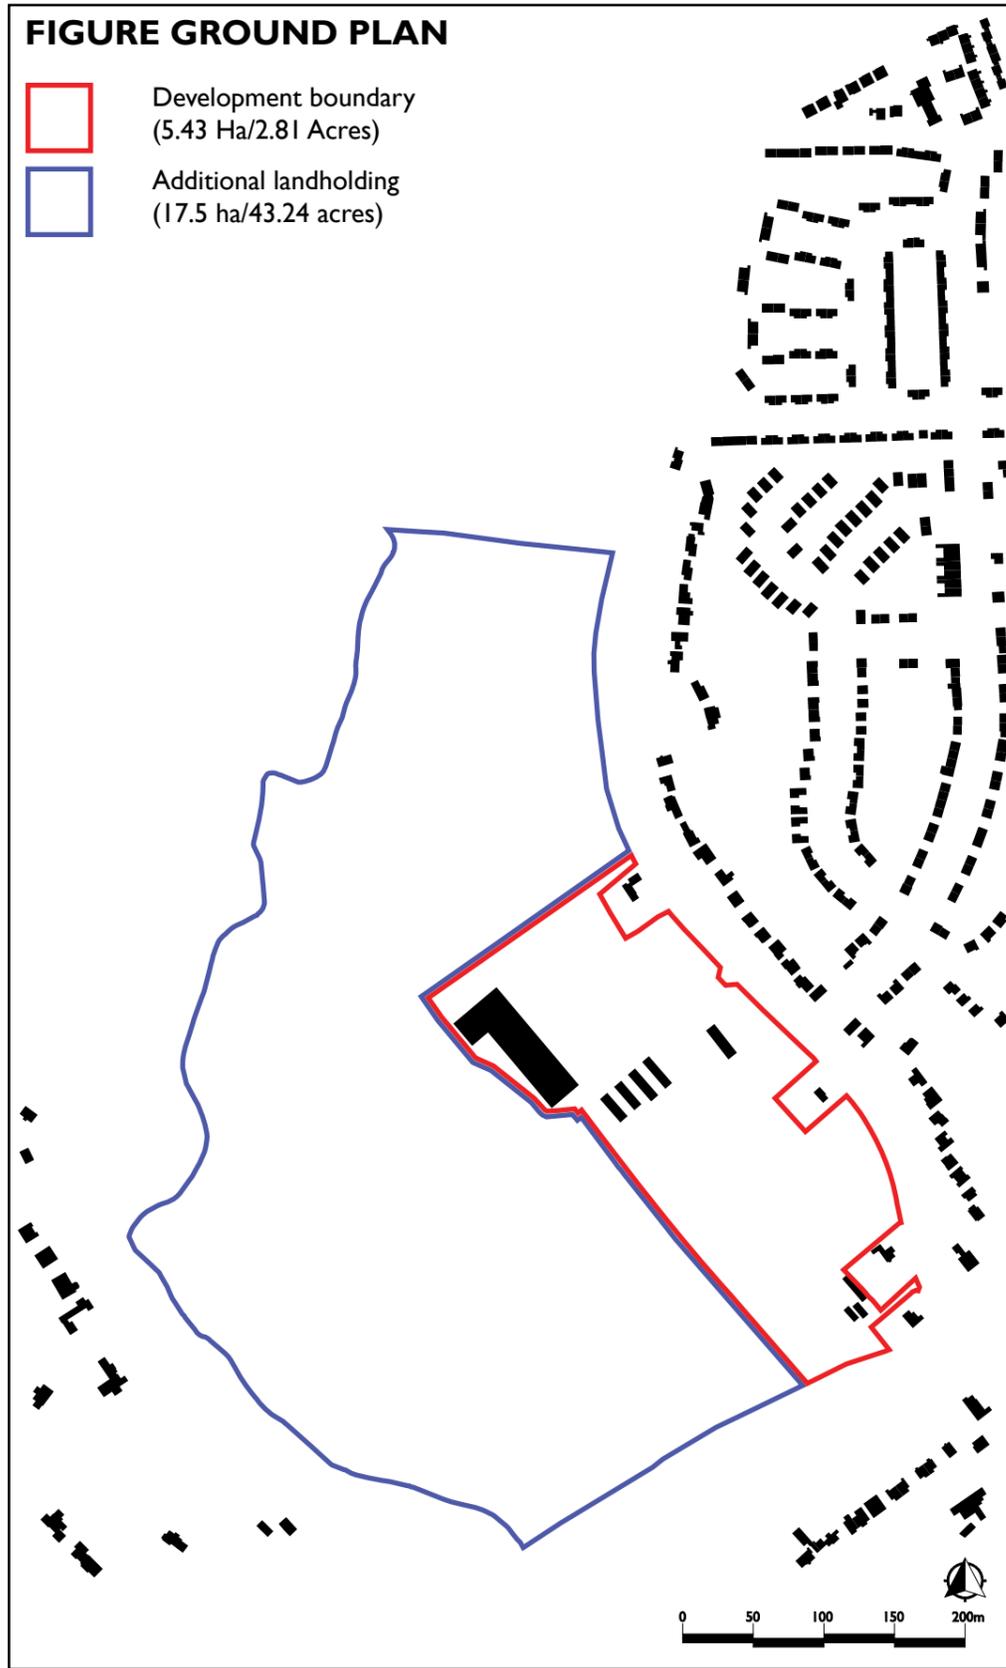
Figure ground plan. Scale-1:5000 at A3 (OS Copyright)
